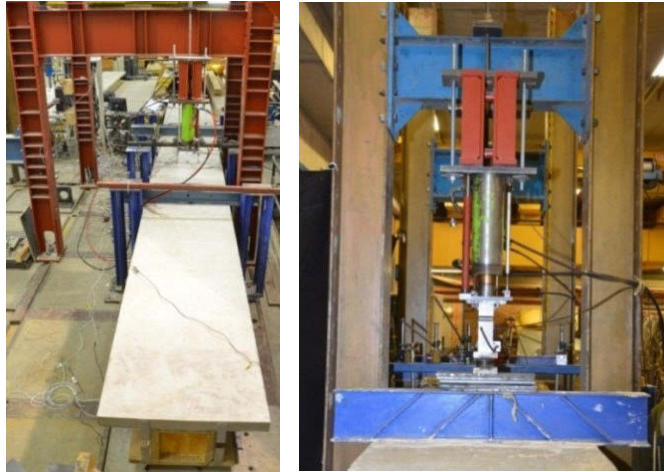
Load frame, hydraulic jacks, load cells and TCC specimen
